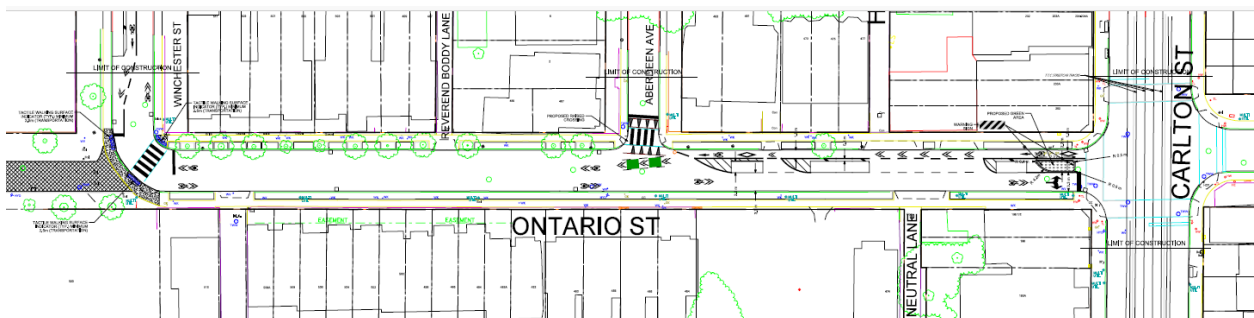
Illustration of the proposed design on Ontario Street between the Winchester Park trail and Carlton Street.
